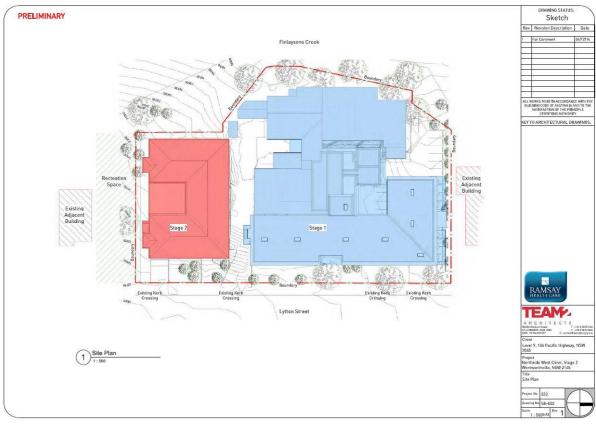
New Building on-site location Note: stage 1 refers to the annex currently under construction (as identified in the Introduction)
